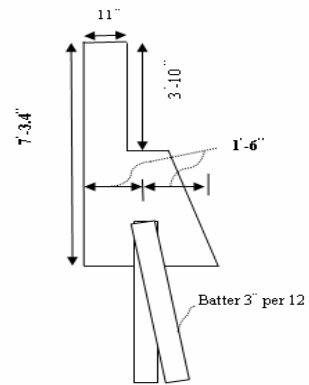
Schematic Section of abutment of Old Wahite Bridge.
